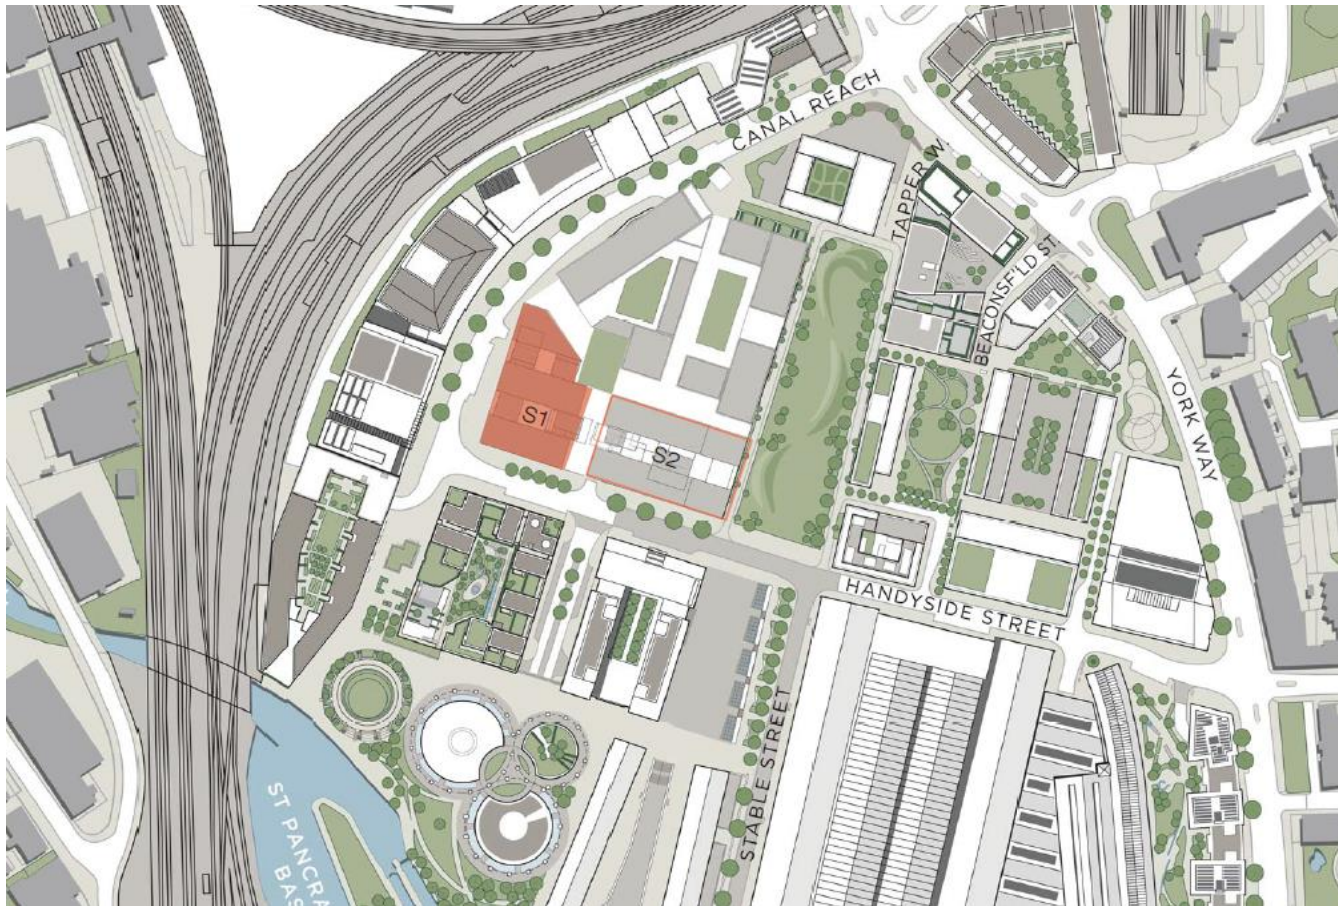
Site location of Building S1 with the King's Cross Central masterplan area
